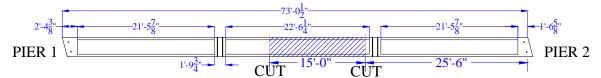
Plan View of Span 2 Beam 4 of Clearfield Creek Bridge
